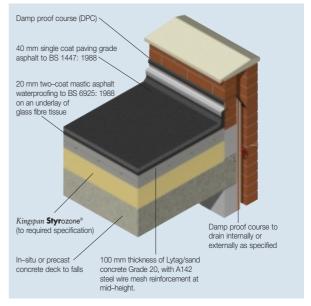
Concrete Slab Finish Loading Bays and Service Decks Commercial Vehicles (Design Should be Verified as to Suitability for Specific Wheel Loads)
